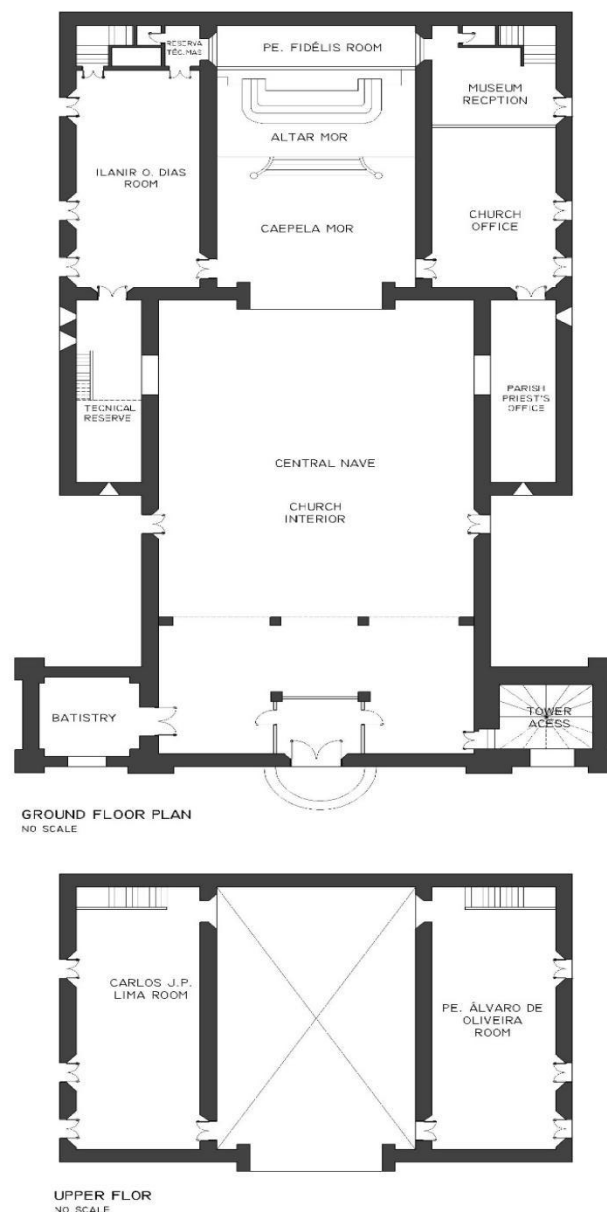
Ground and mezzanine floor plans of the Igreja Matriz Nossa Senhora da Graça, São Francisco do Sul, Santa Catarina State, Southern Brazil. Source: IPHAN archives, redrawn in AutoCAD by the author (2024).
